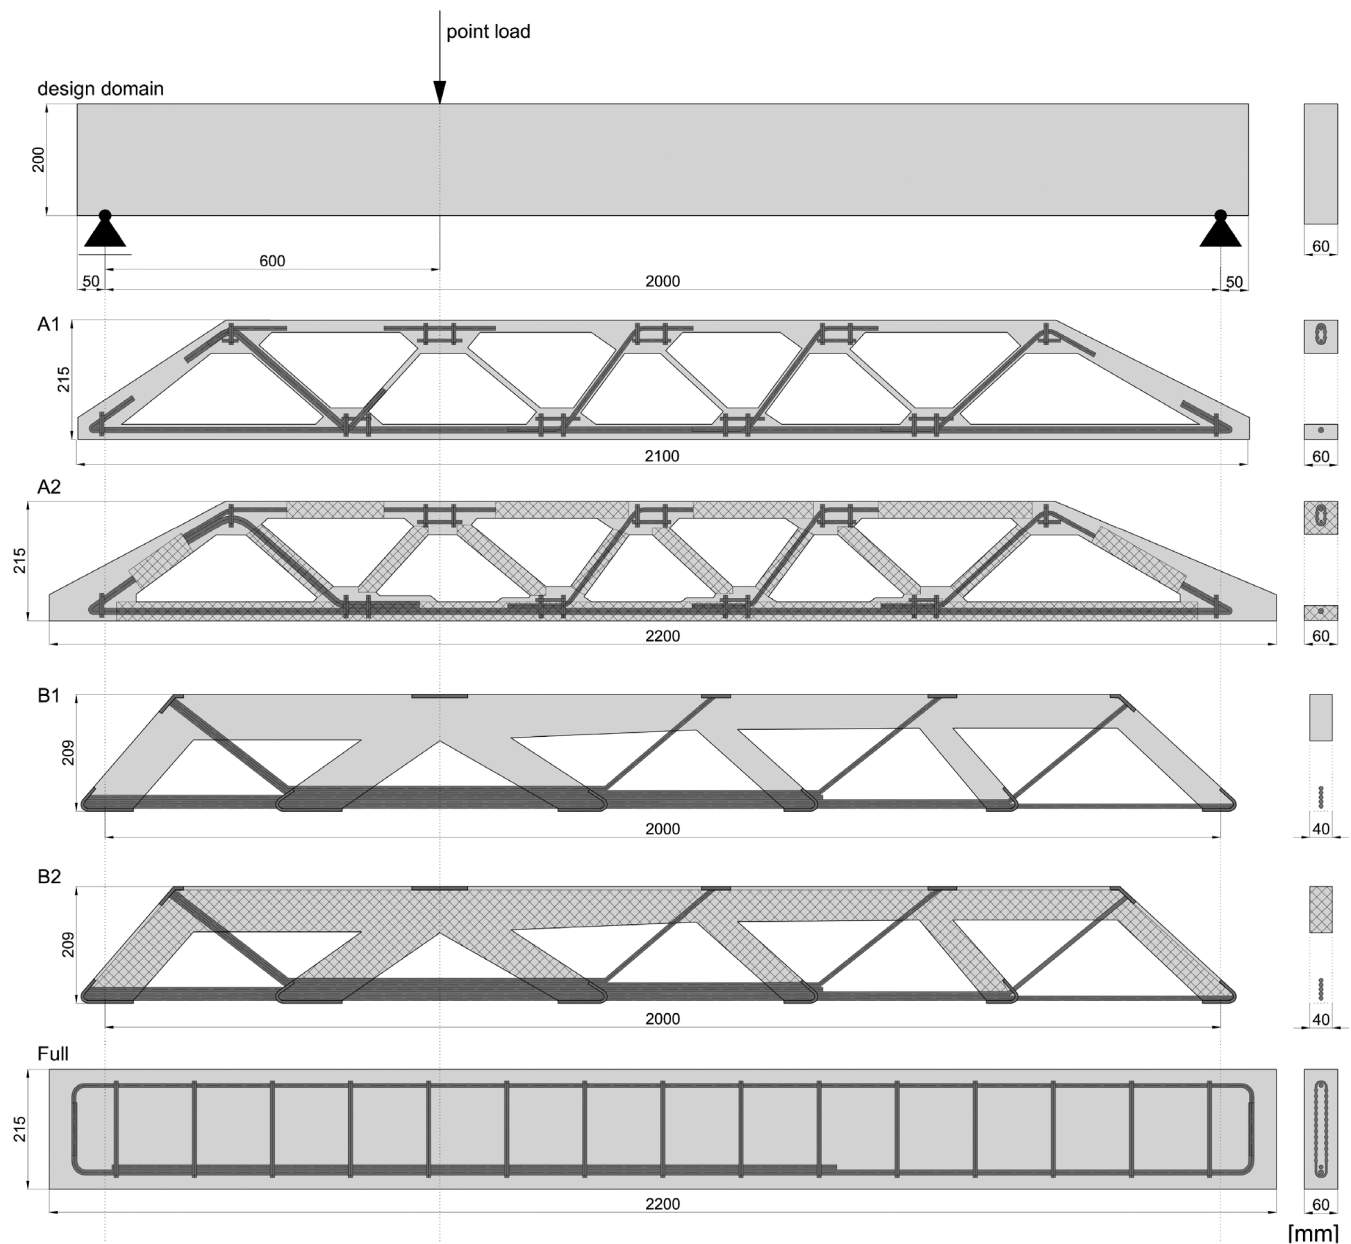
Design domain (top) and girder specimens with reinforcement layout (fine mesh—hatched areas, reinforcement bars, laser-cut reinforcement elements) with cross sections.
